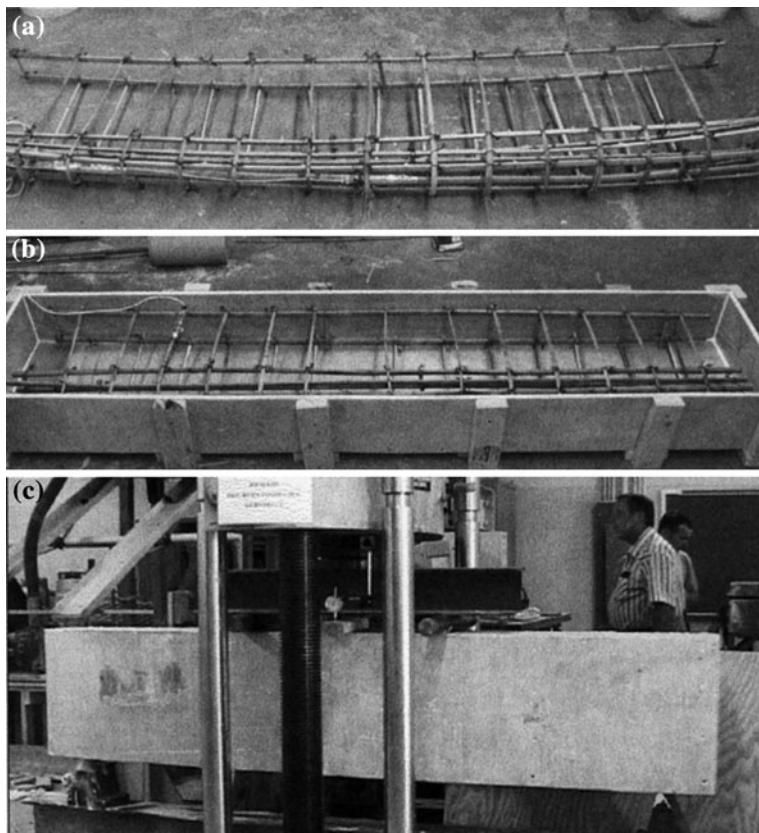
Concrete beam reinforced with bamboo rebars and bamboo stirrups: a finished bamboo reinforcement, b finished reinforcement in the form, c test set-up (Khare 2005)
